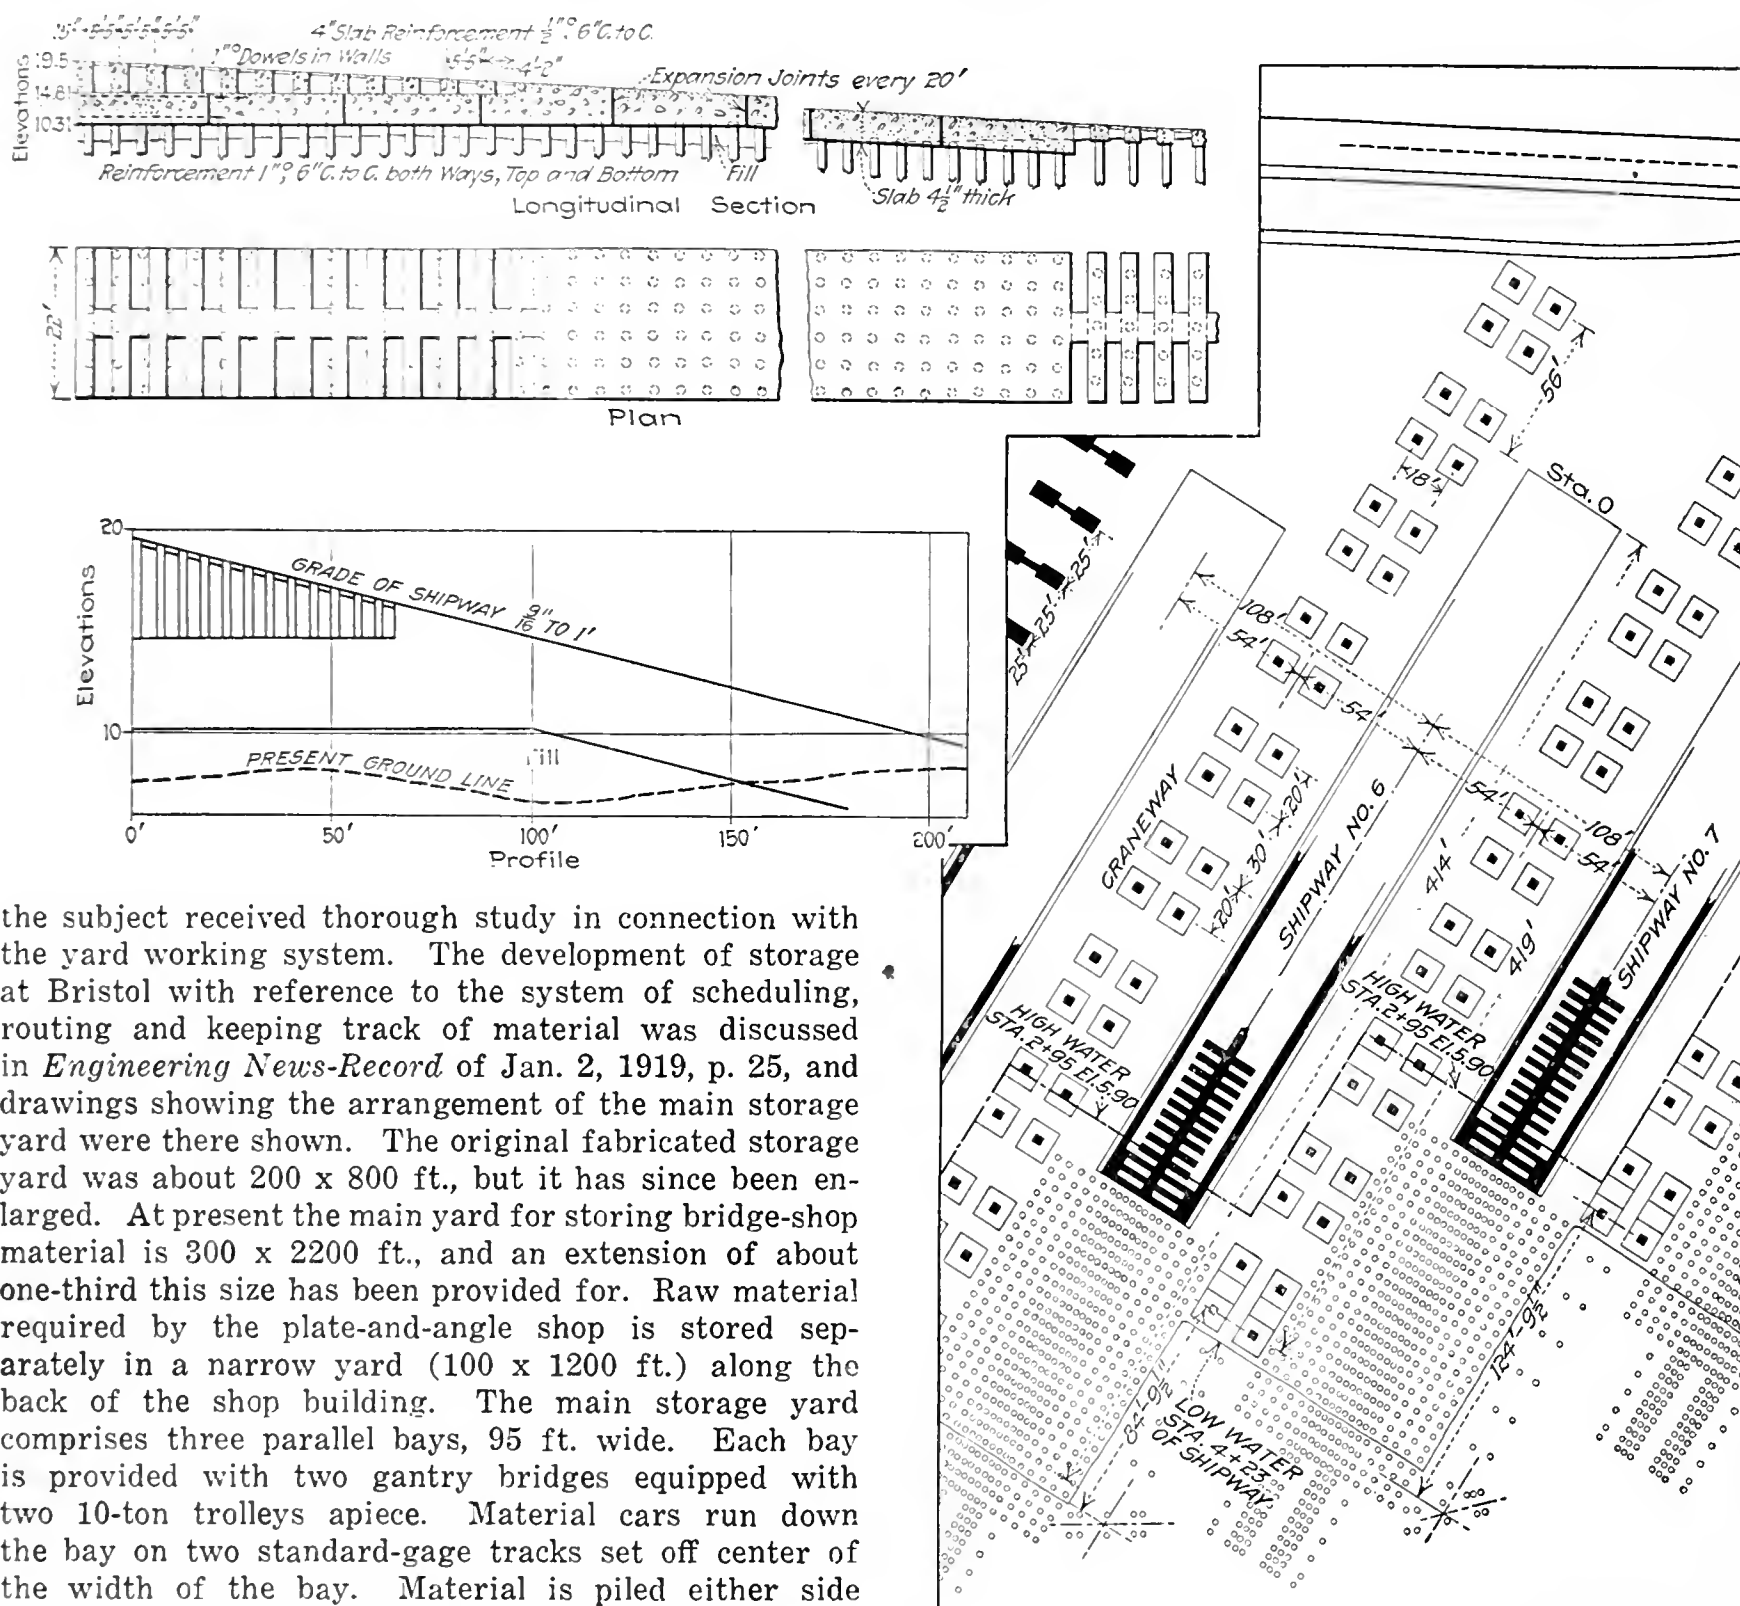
REINFORCED-CONCRETE SLAB WAYS FLUSH WITH GROUND
